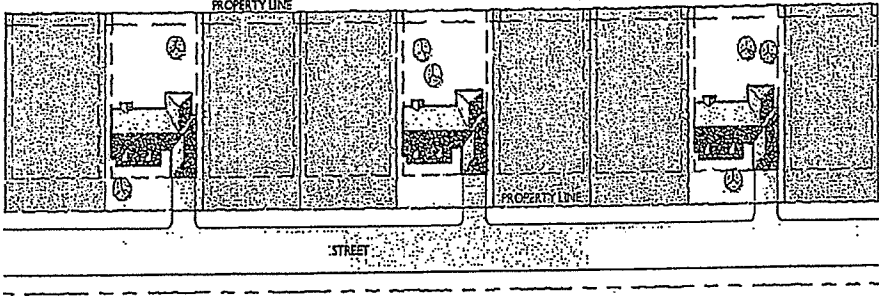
Same Plan, Different Elevation, Same Side of Street: two full lots shall separate homes that share a floor plan, have different elevations, but occur on the same side of the street.
